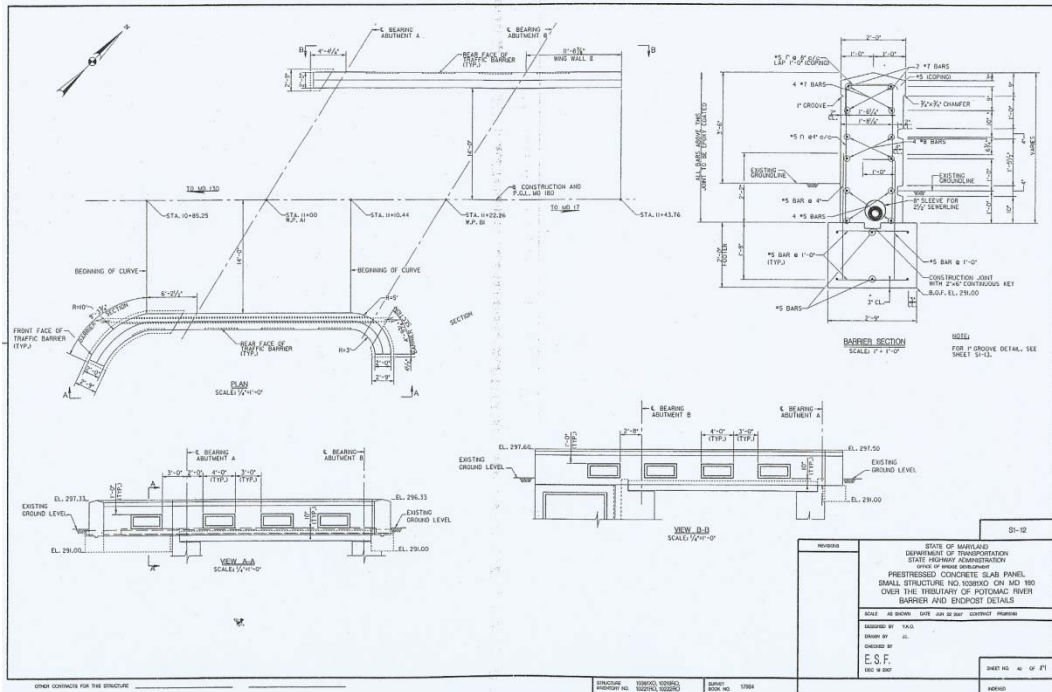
Parapet Details of the Knoxville, MD, Bridge
